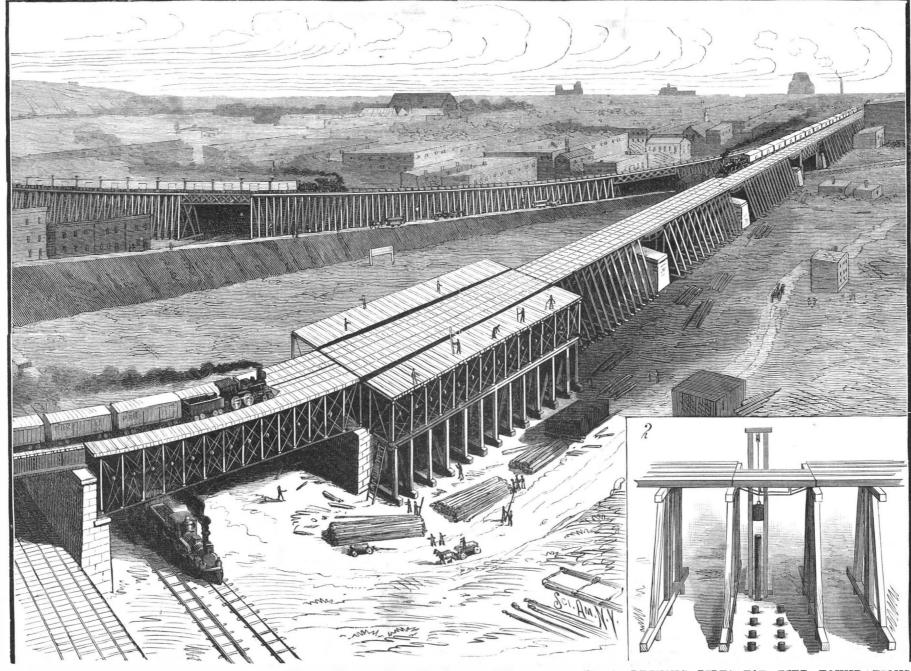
DRIVING PILES FOR PIER FOUNDATIONS. -BRIDGE BUILDING ON THE PENNSYLVANIA RAILROAD IN JERSEY CITY.
